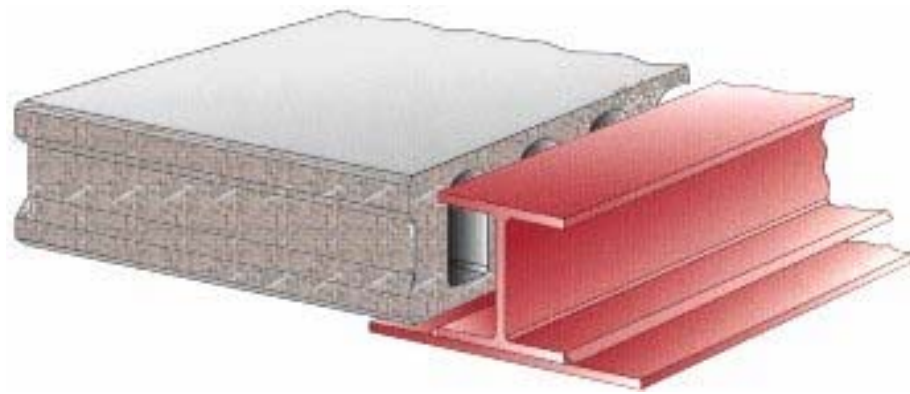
SlimFlor system with a wide flange plate welded to the underside of the beam
